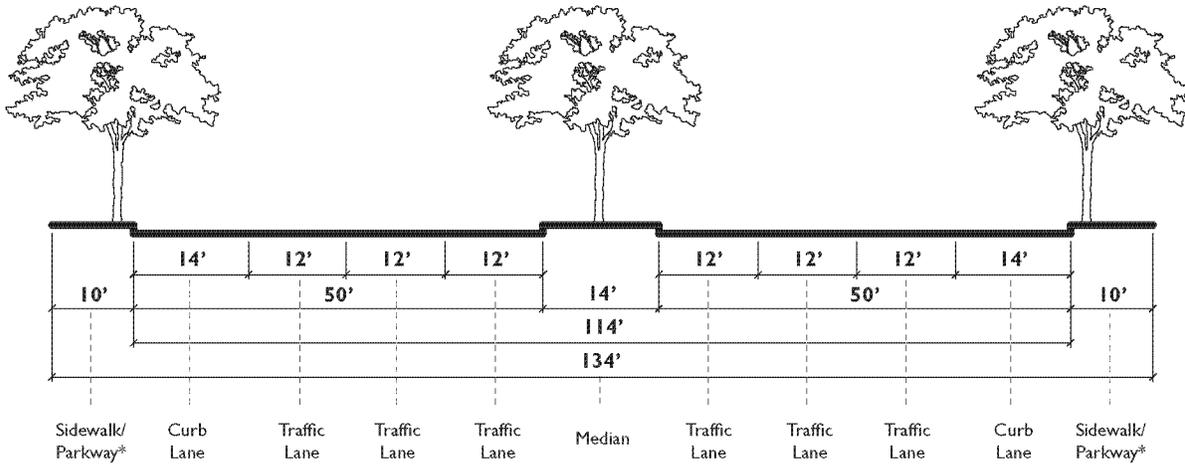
(1 of 2): CITY OF CHINO GENERAL PLAN ROADWAY CROSS-SECTIONS
